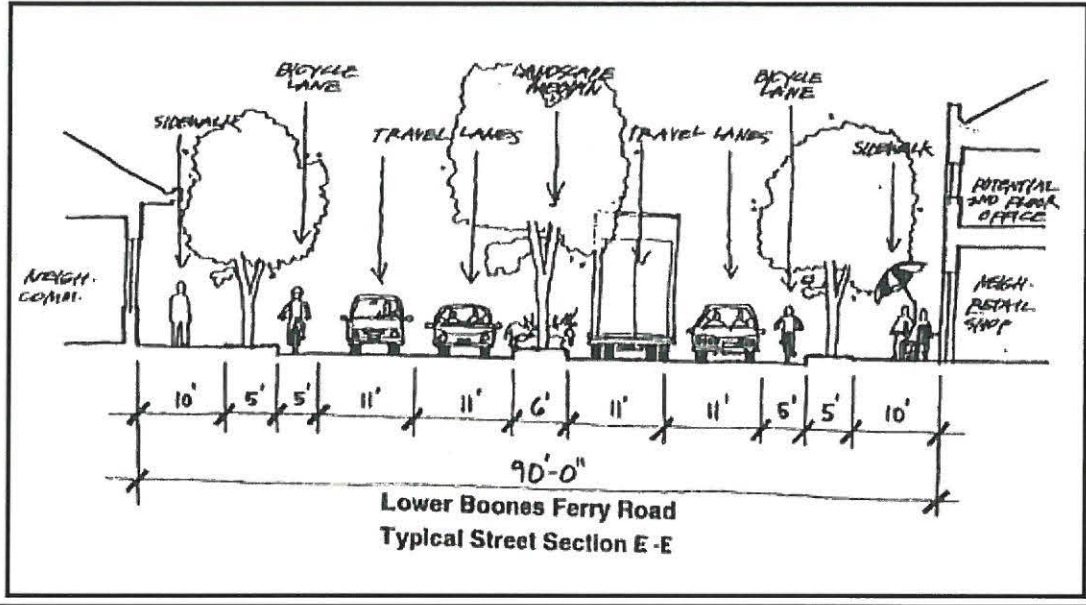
V: Lower Boones Ferry Road Typical Section E-E
